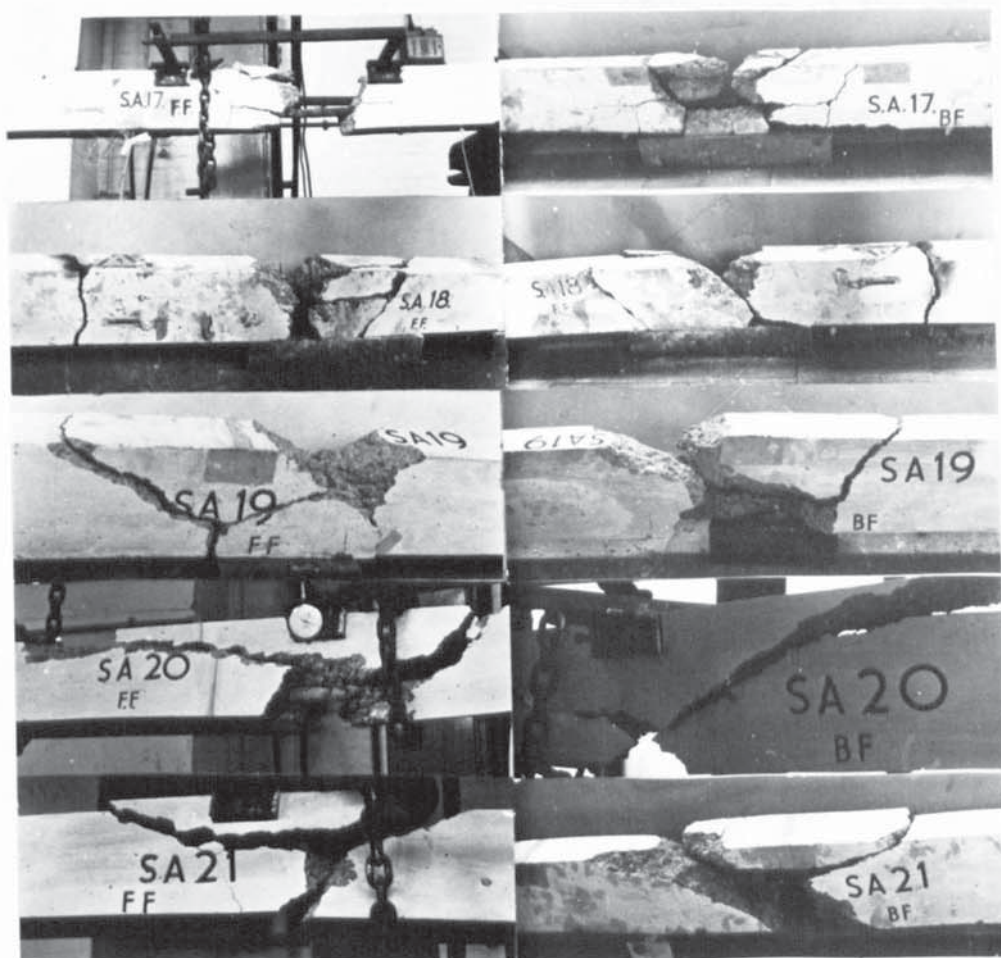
Typical failure patterns of prestressed beams
